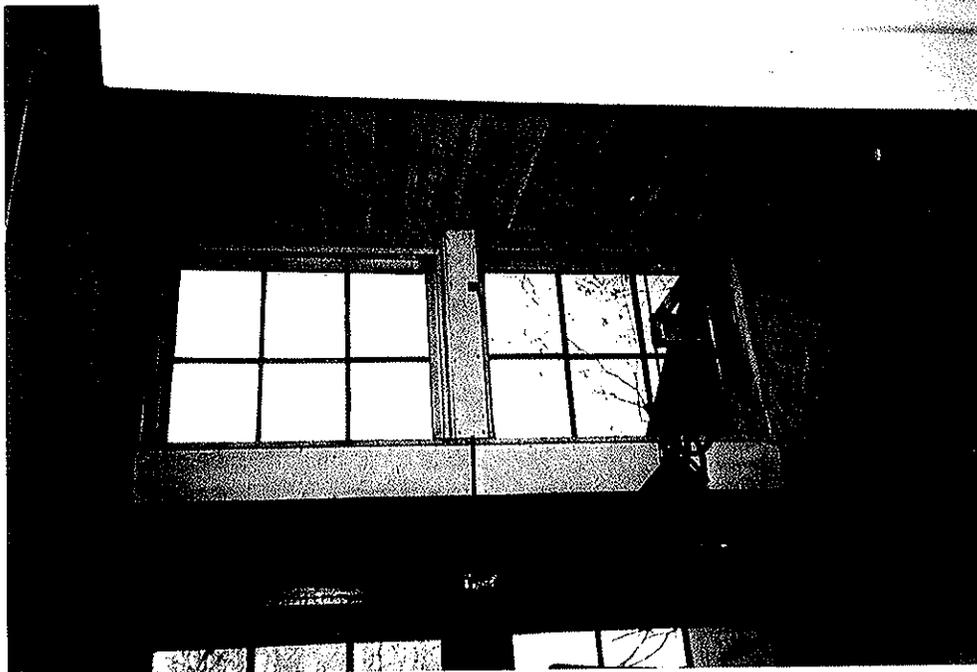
Young Studio - Etching Room [Room 102], North Wall Dormer and Windows W203 & W204 (1994).
